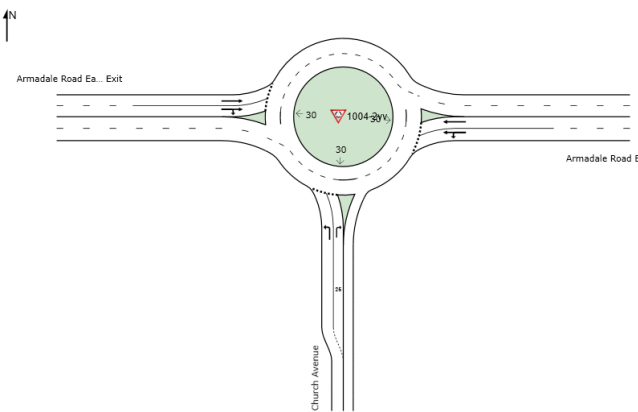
Armadale Road/ Church Avenue – Roundabout option
